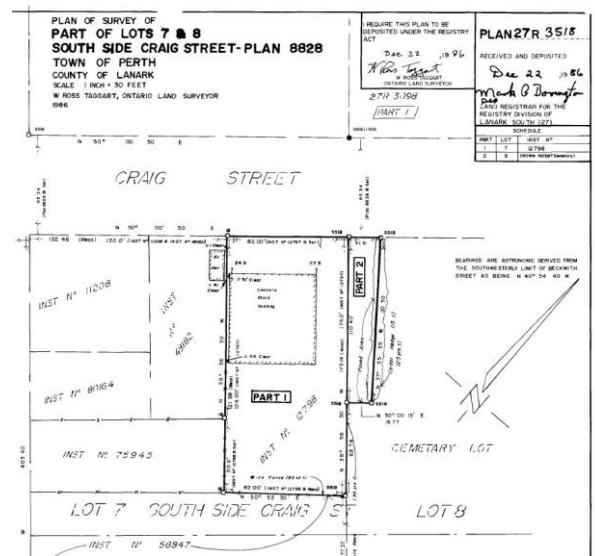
Excerpt of Plan 27R-3518 Showing the Location of the Building Relative to the Property Boundary
